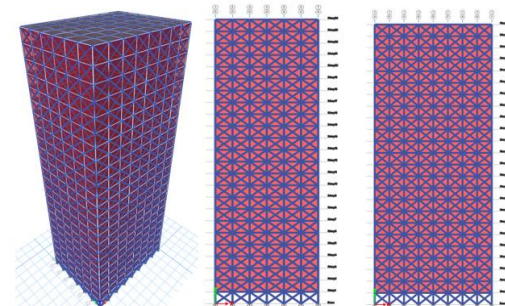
3D view MODEL-IV Fig. 1.4b Masonry Infill Walls
